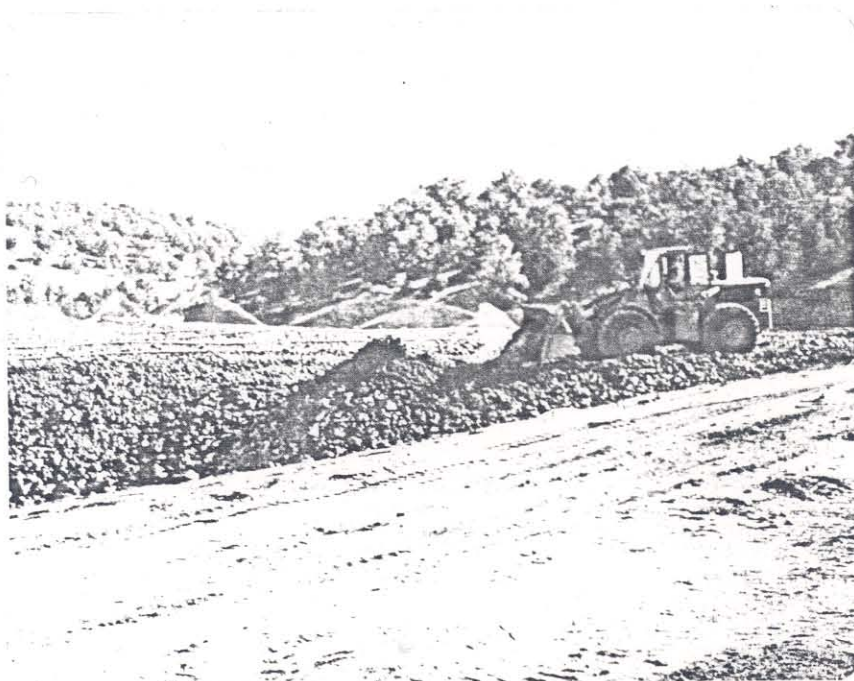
Loader dumping load on Heap #4 approximately 400 feet away.
